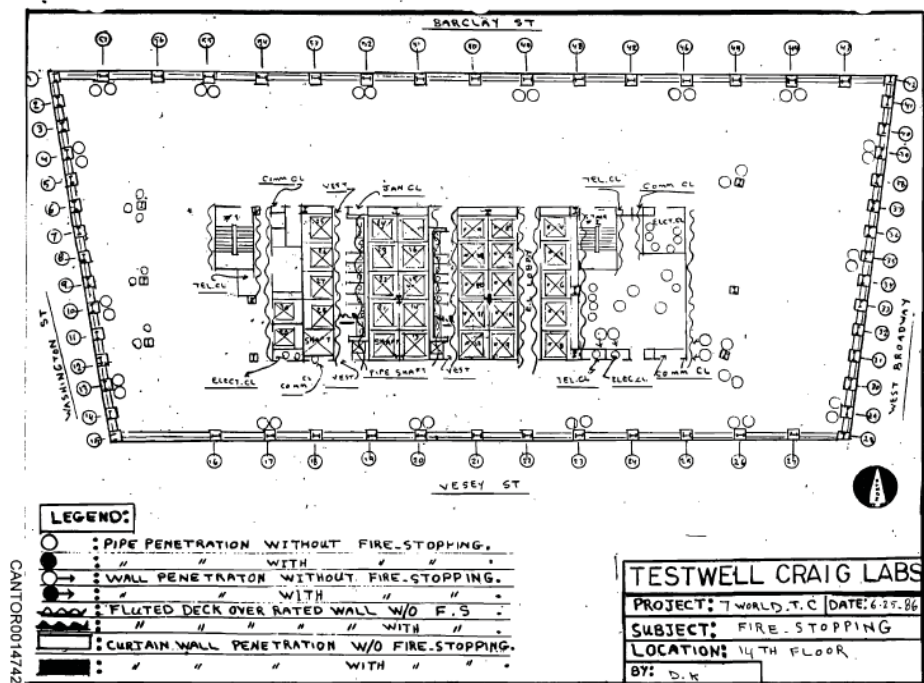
Sketch showing unfilled flutes above fire walls which had firestopping missing (14th floor).
